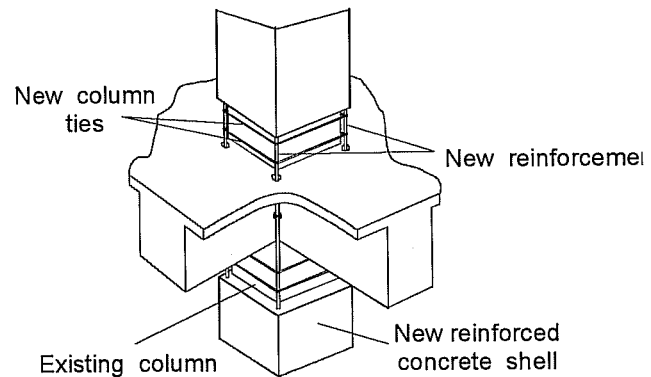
Strengthening of an existing column using reinforced concrete jacketing (adopted from Ref. 62).
